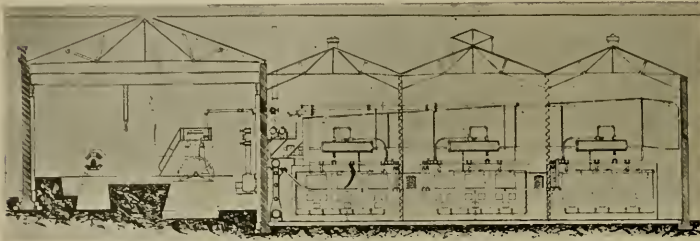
CROSS SECTION—GENERAL ELECTRIC END.
